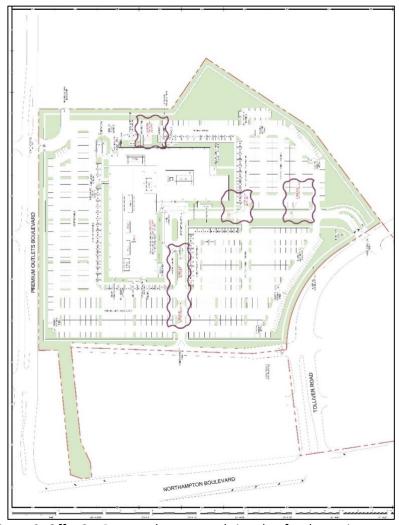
Offer 2 – Proposed conceptual site plan for the project parcel.
